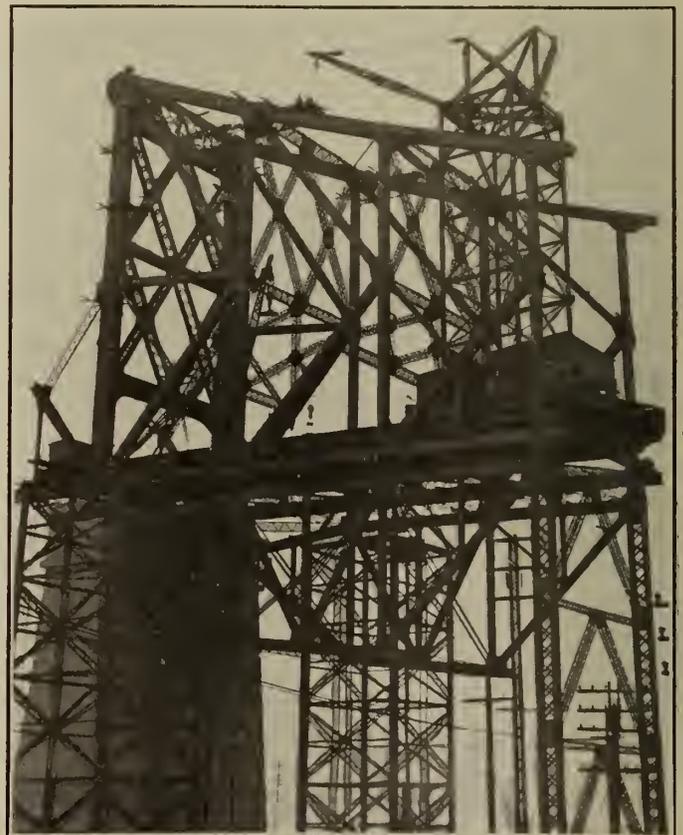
Main Span, North Side—Erection of Anchor Arm being completed to Tower at AL9.
